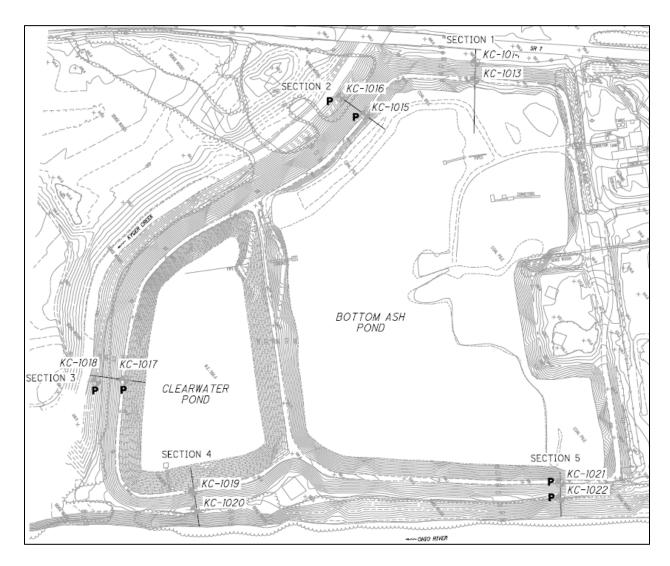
Kyger Creek Station Boiler Slag Pond – Plan View of Cross Sections (DLZ, 2015)
